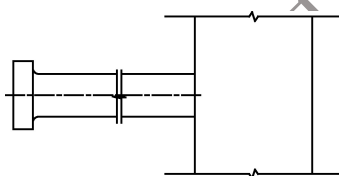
Details of shear studs in the anchorage zone in the tower of the chongqing dongshuimen yangtze river bridge
